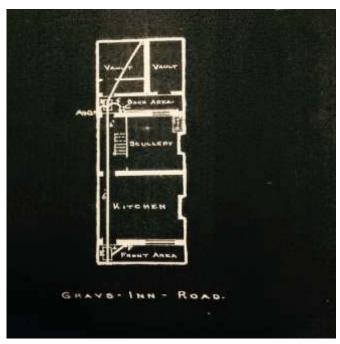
Drainage plan, no 77 Gray's Inn Road (1897).
